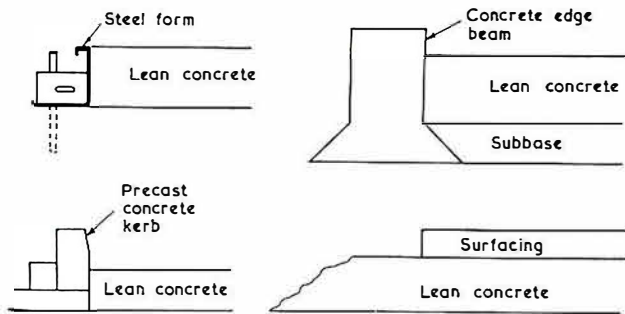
Methods of providing edge restraint to lean concrete bases.
